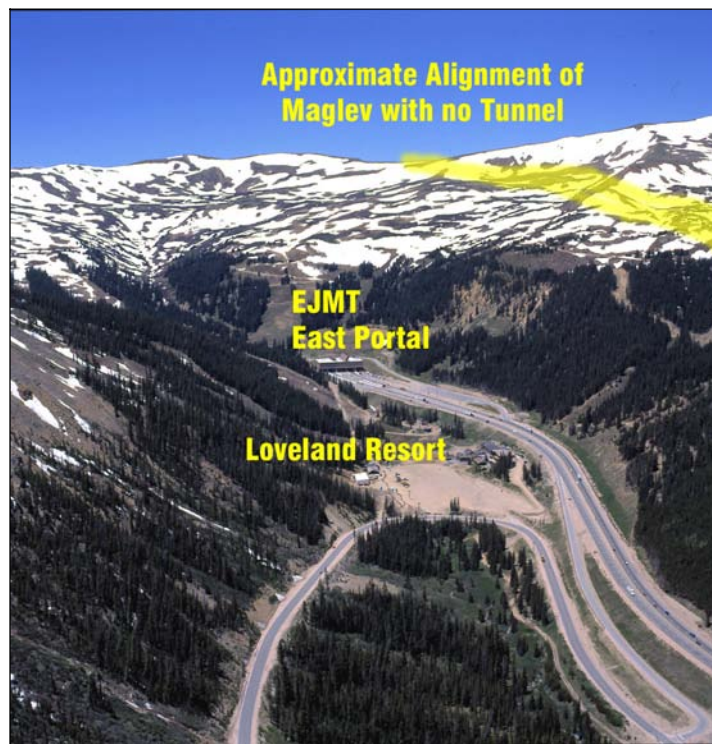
Westbound View of Alternative Alignment with No Tunnel Over Continental Divide
